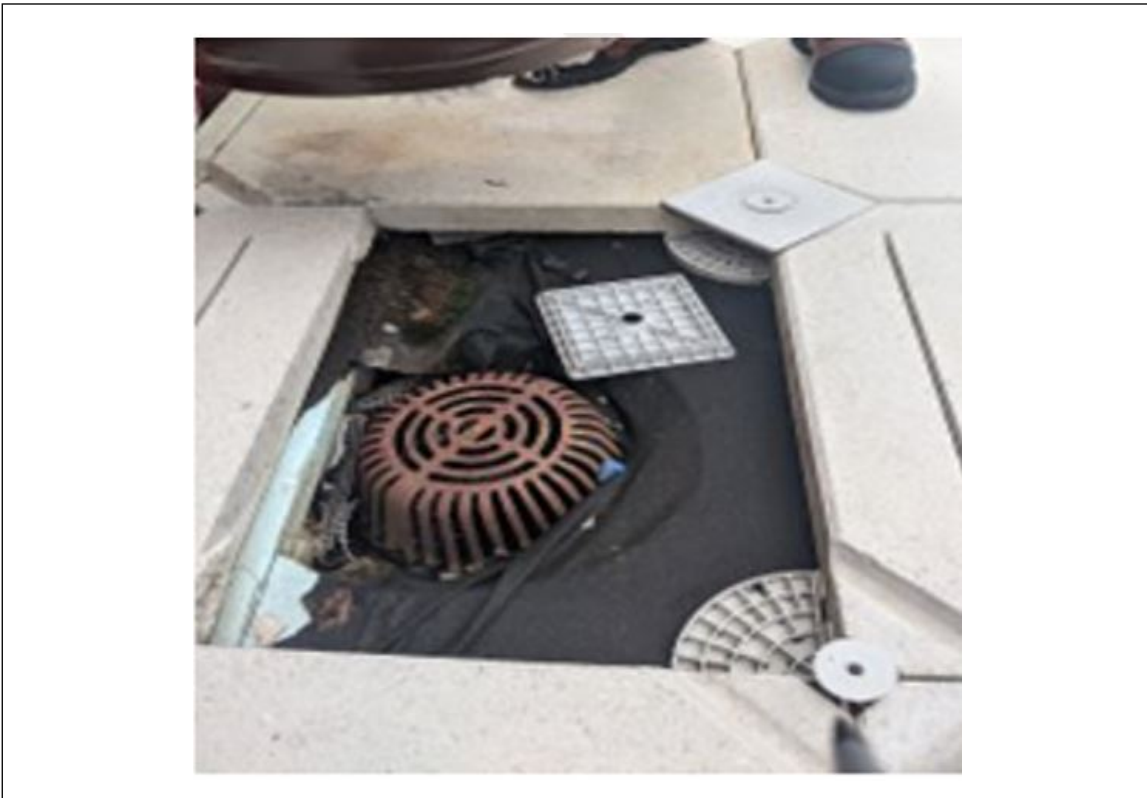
Rooftop concrete pavers elevated ½ in. (13 mm) above extruded polystyrene (covered with landscape fabric) using plastic pedestals
